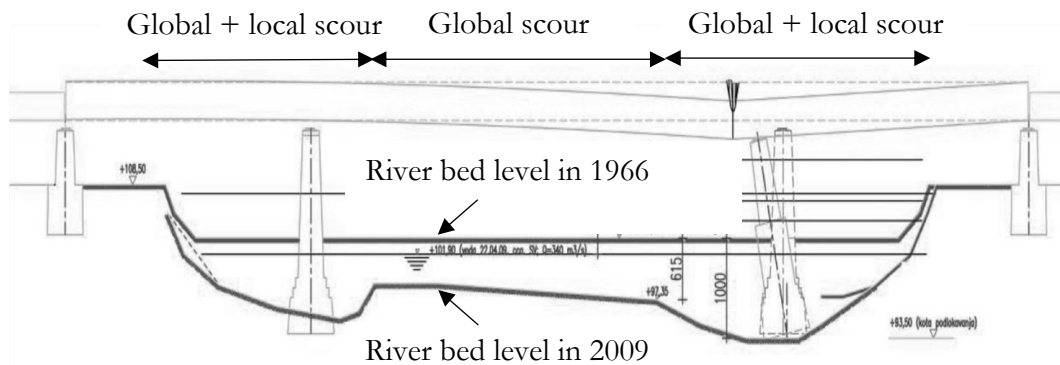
Zones of global and local scour and comparison of historic bed levels around railway bridge Jakuševac, source: Gilja et.al. [68] (reprinted with permission).
